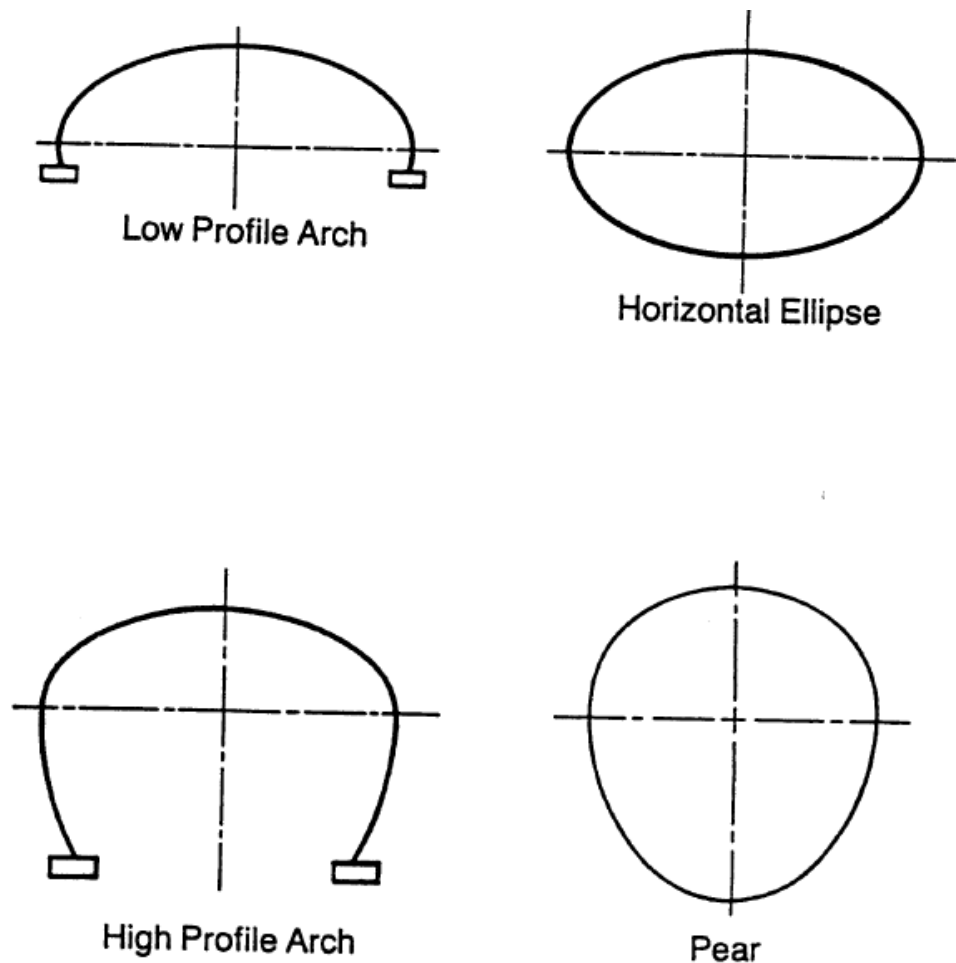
(Exhibit 93) Typical Long-Span Shapes
